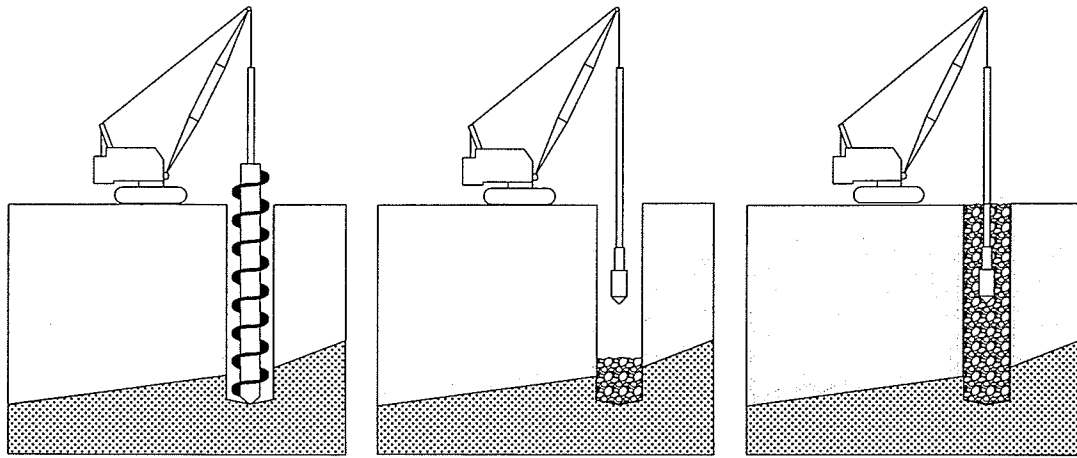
Replacement method for installation of rockfill columns (after Baumann and Bauer 1974)
